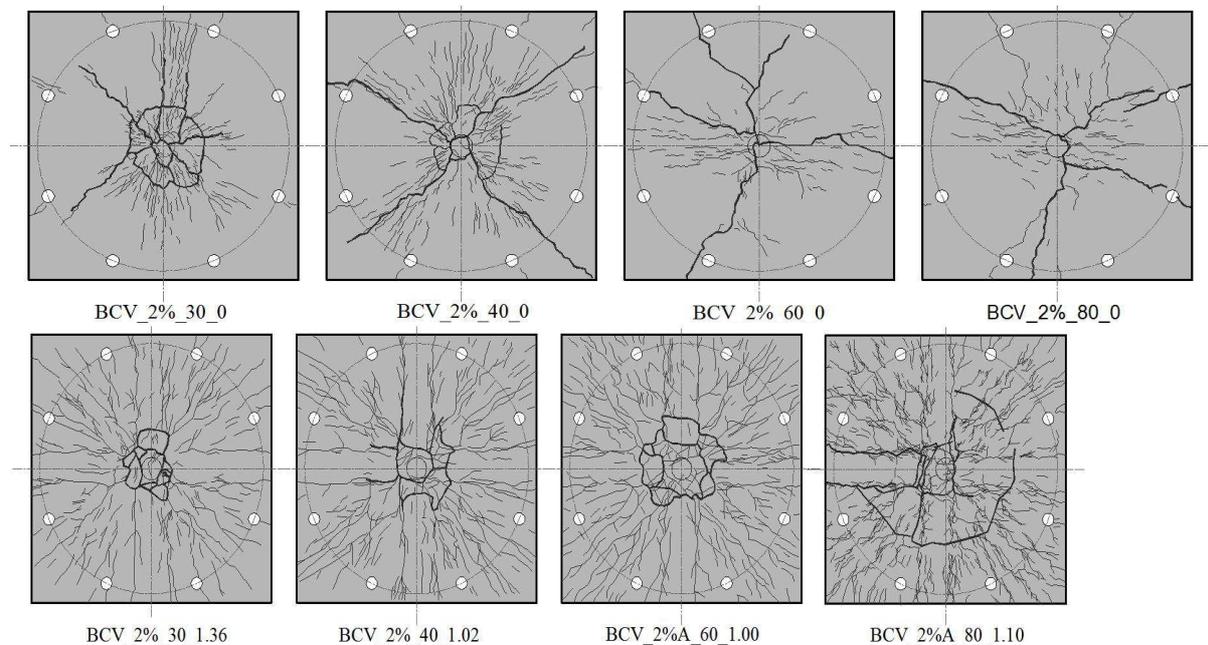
Cracking pattern of the 2 % slabs with and without steel reinforcement
